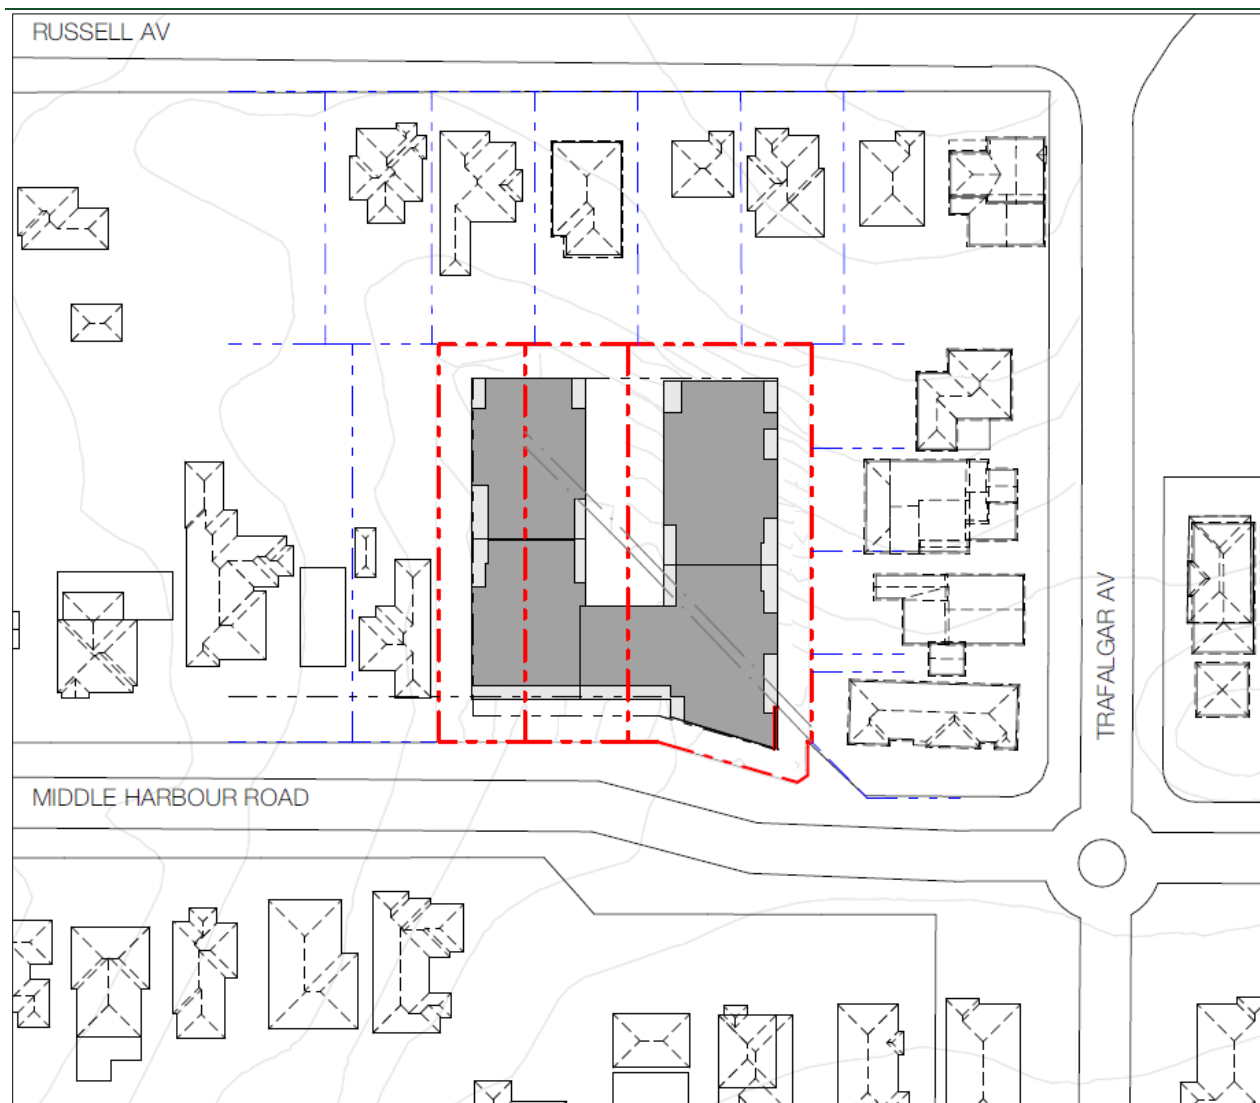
Site Plan in Existing Context (Source: DKO Architects, 2025)
